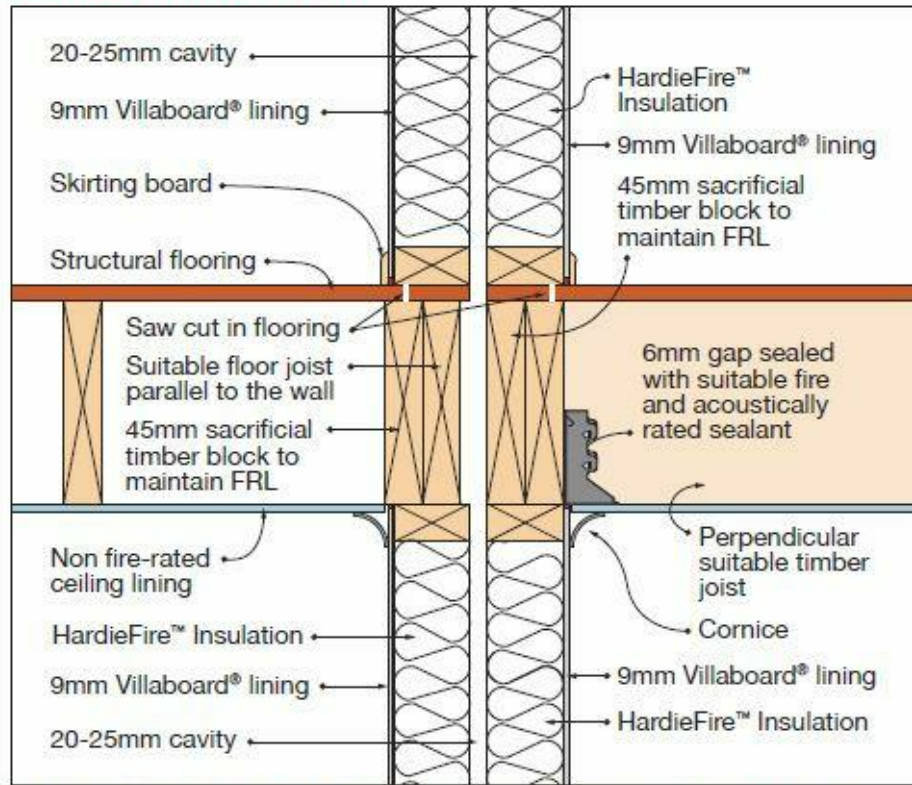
HARDIESMART™ INTERTENCY WALL SYSTEM WITH UPPER STOREY FLOOR OPTION 1
